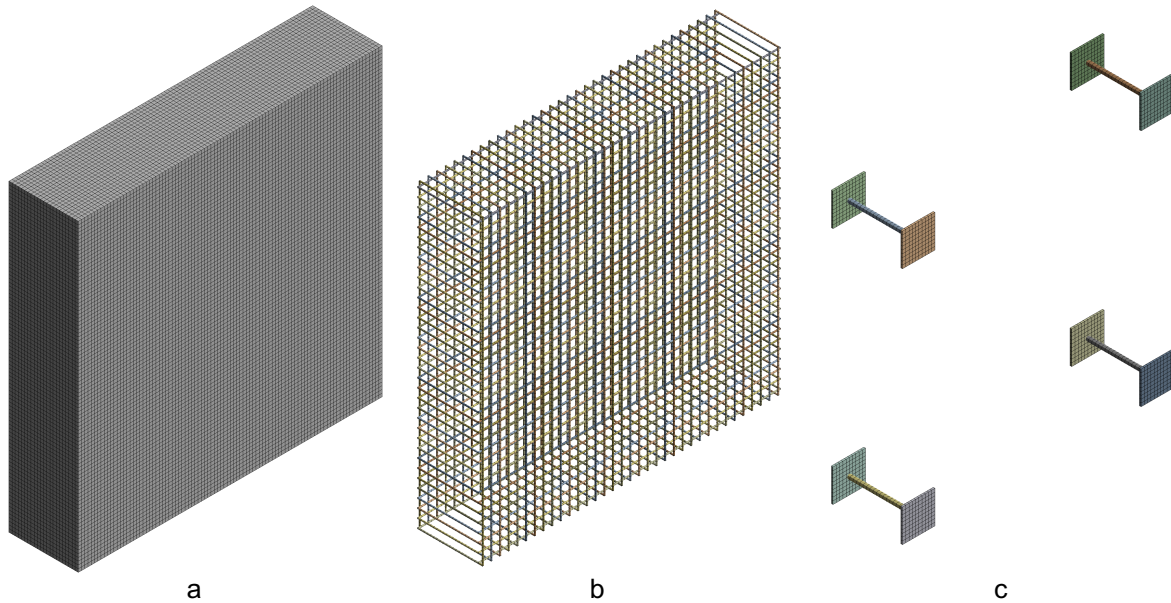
RC slab model parts: a – concrete; b – rebar; c – anchors with supporting steel plates
